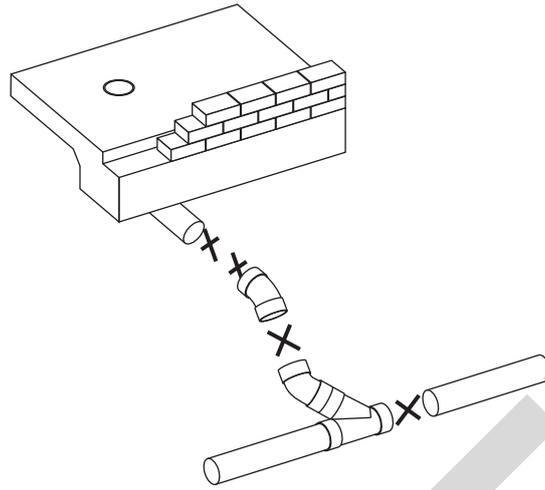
TYPICAL EXAMPLE OF GRADED RISERS
